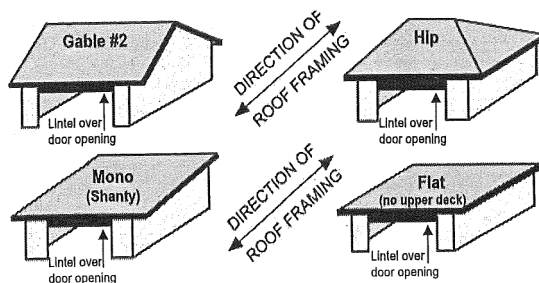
Roof Styles with Lintel SUPPORTING Roof
